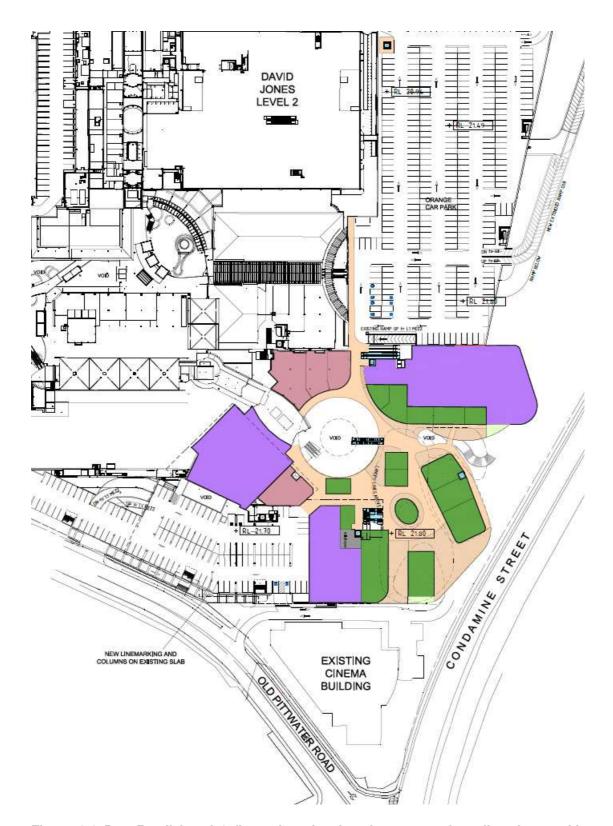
Part Retail Level 2 floor plan showing the proposed retail and carparking areas
